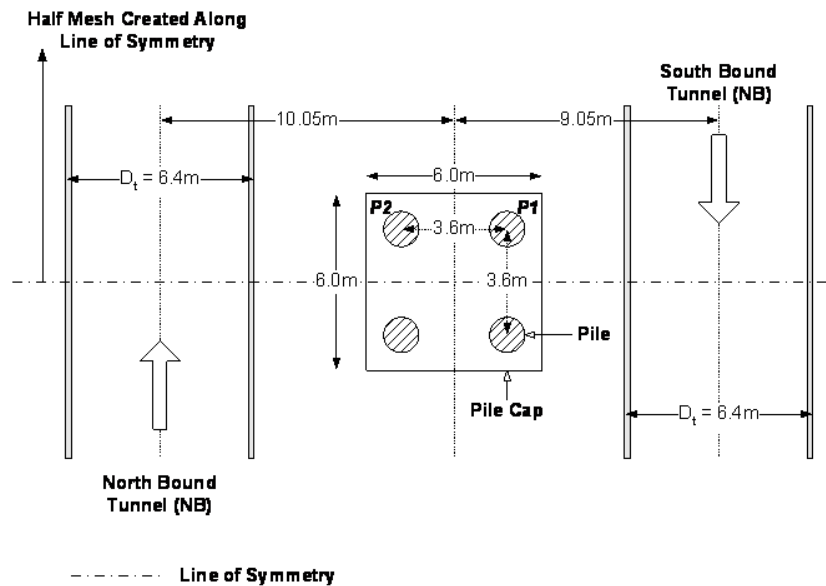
Plan view of relative pile-tunnel location drawn to scale
